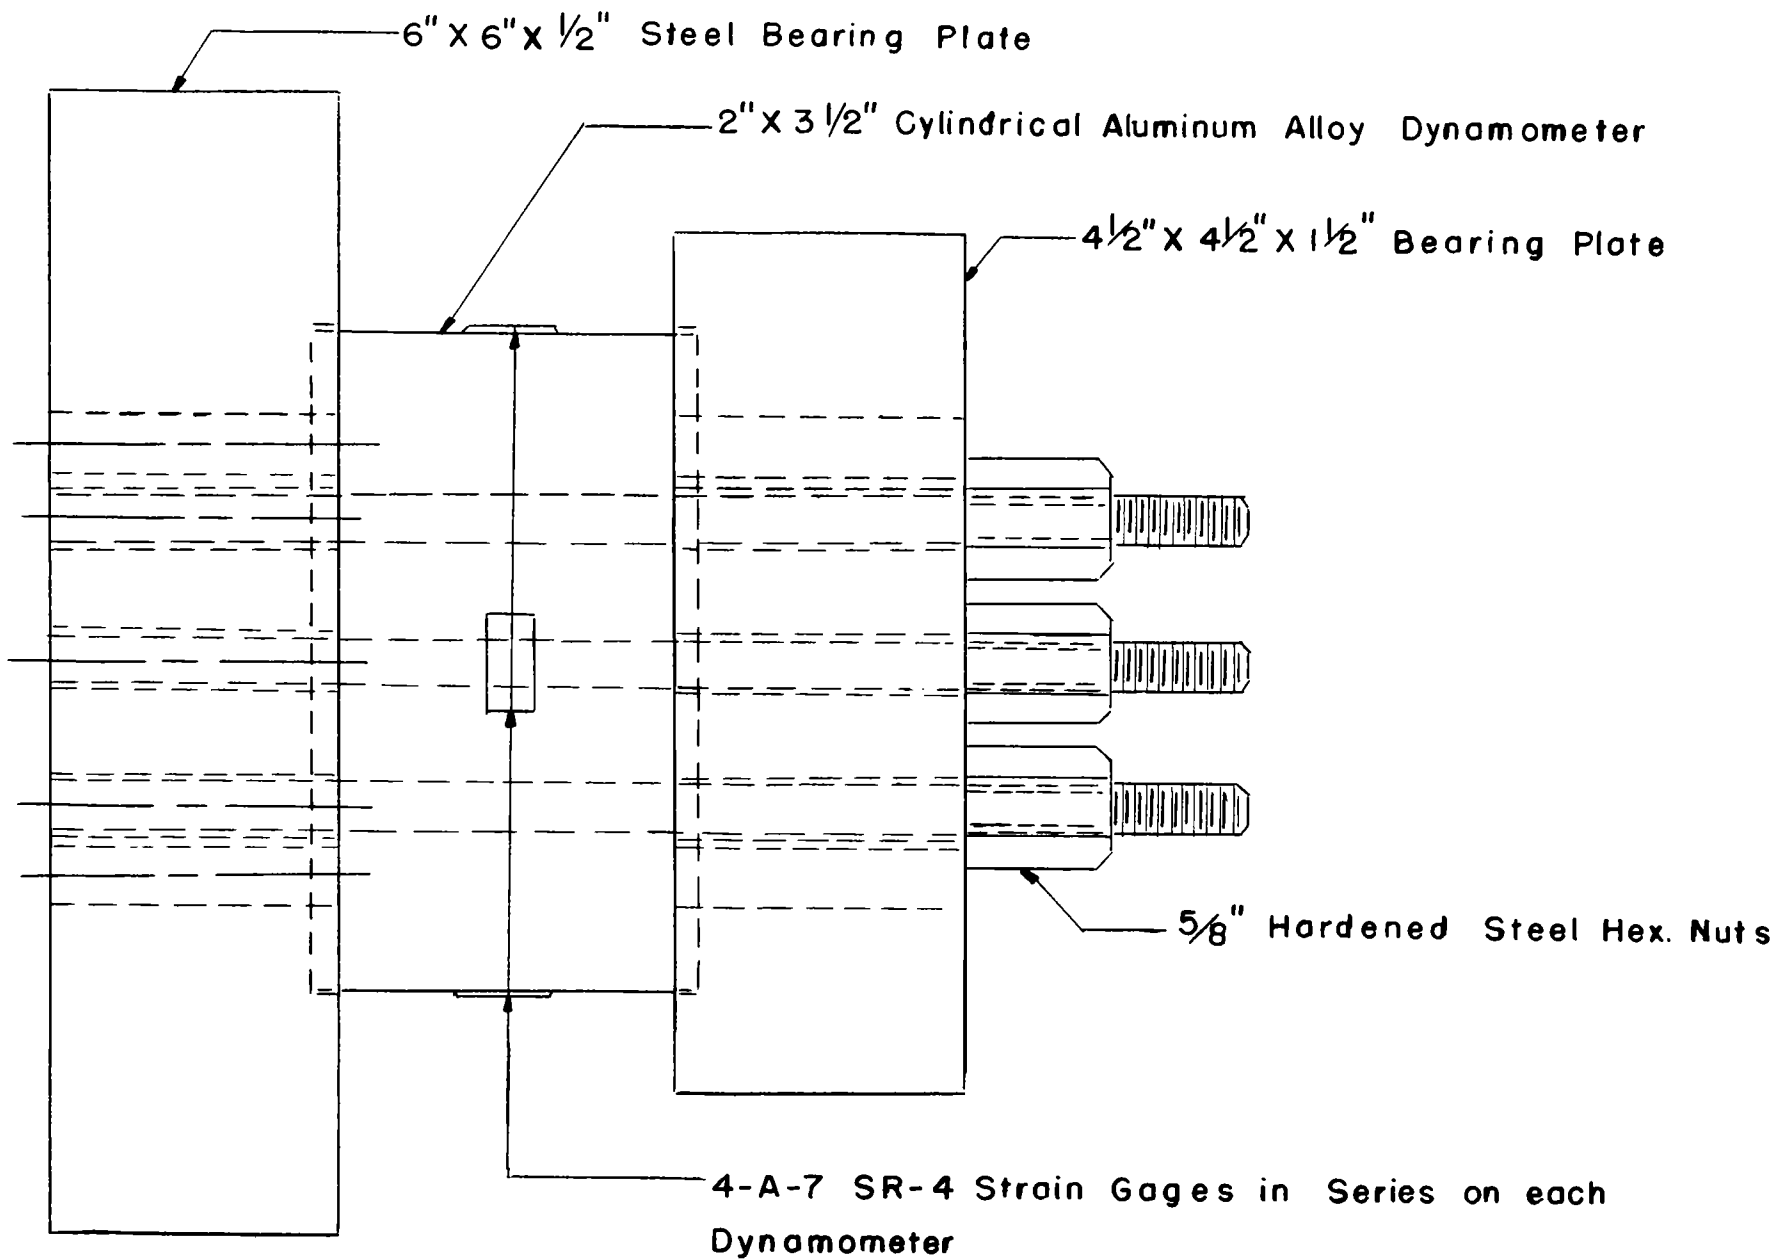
DETAIL OF REINFORCEMENT ANCHORAGE AT DYNAMOMETER END OF BEAM
